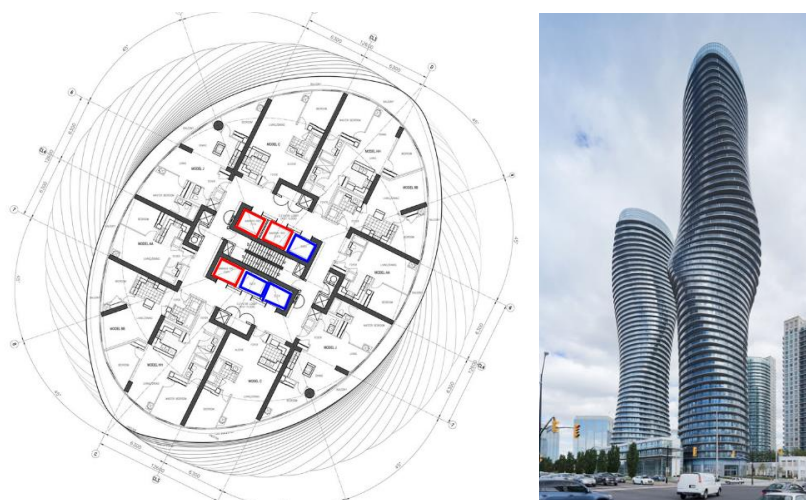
The floor plan of the Absolute Towers in Mississauga, Ontario, Canada, and its view from the outside; designed by MAD Architects (URL 2).
